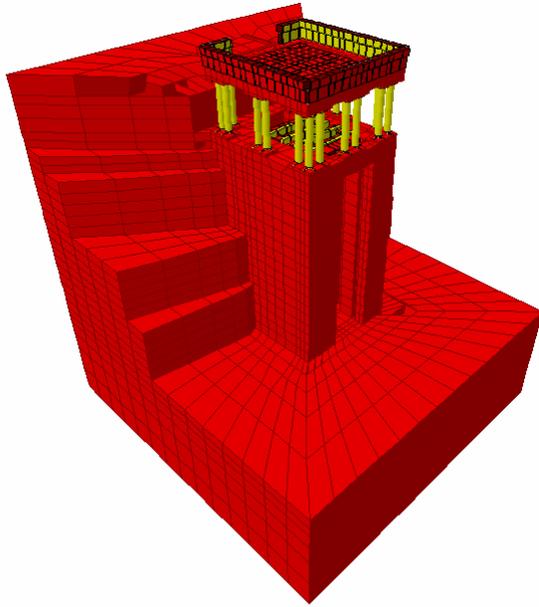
Front view of the tower, foundation, abutment, and pavilion model
